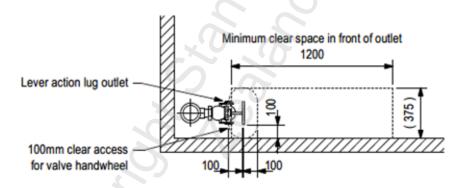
(d) - Hydrant outlet - Handwheel and Lever action lug outlet - Plan view
